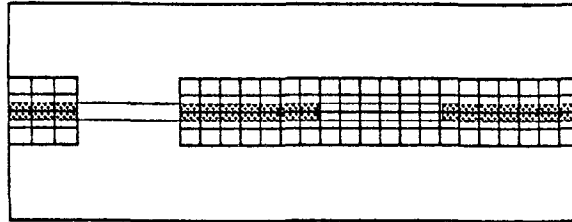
Additional WWF reinforcement in Type 1 Specimens.
